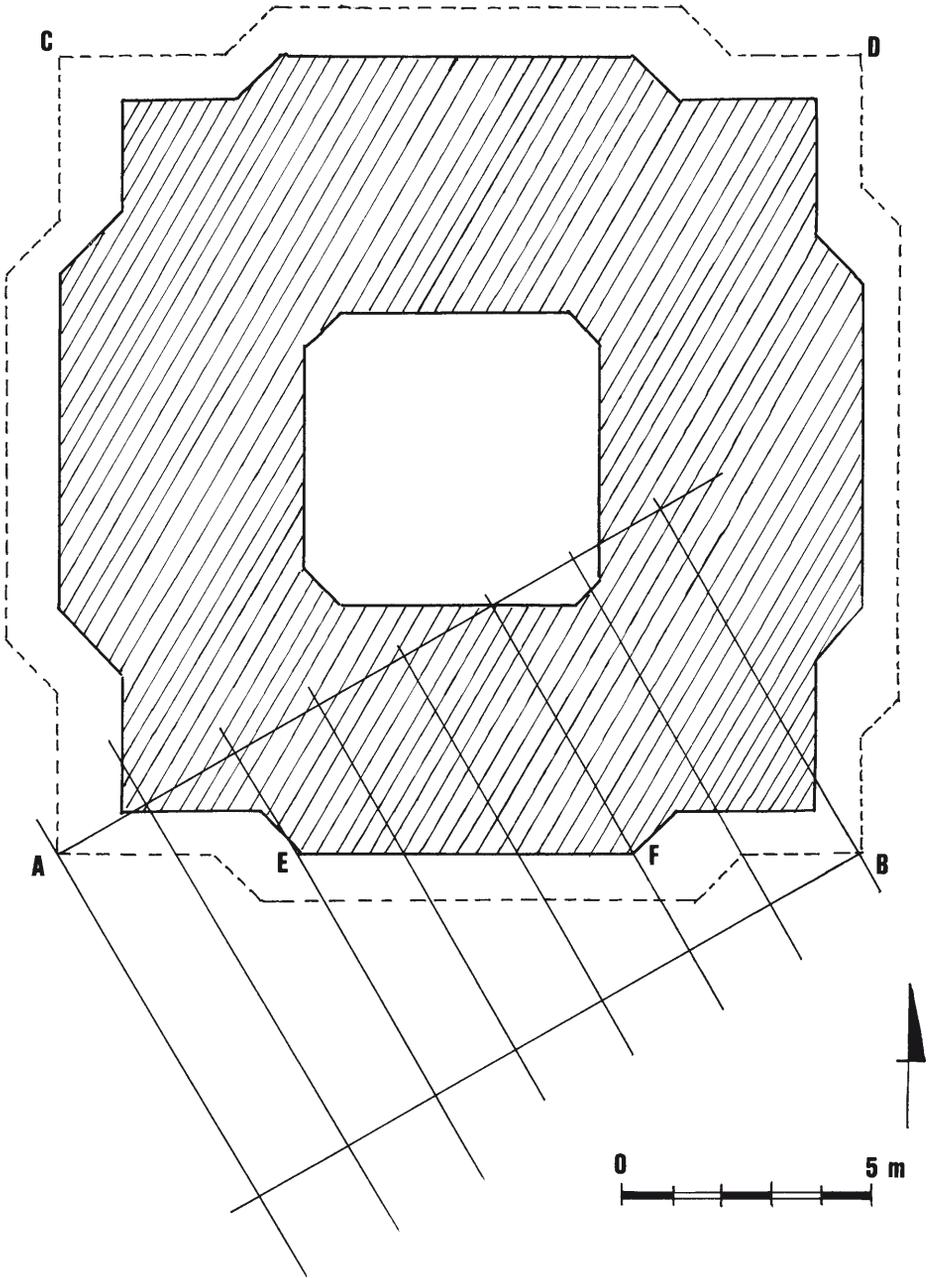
Gangaikondacholapuram, layout of an octagonal false floor of the central tower.
